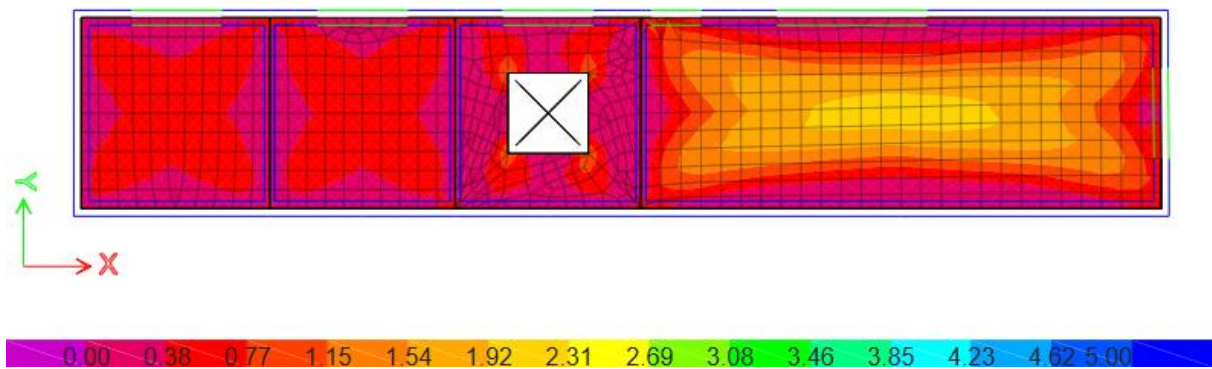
Top Slab: Direction 2 Bottom Rebar Intensity (cm<sup>2</sup>/m)
